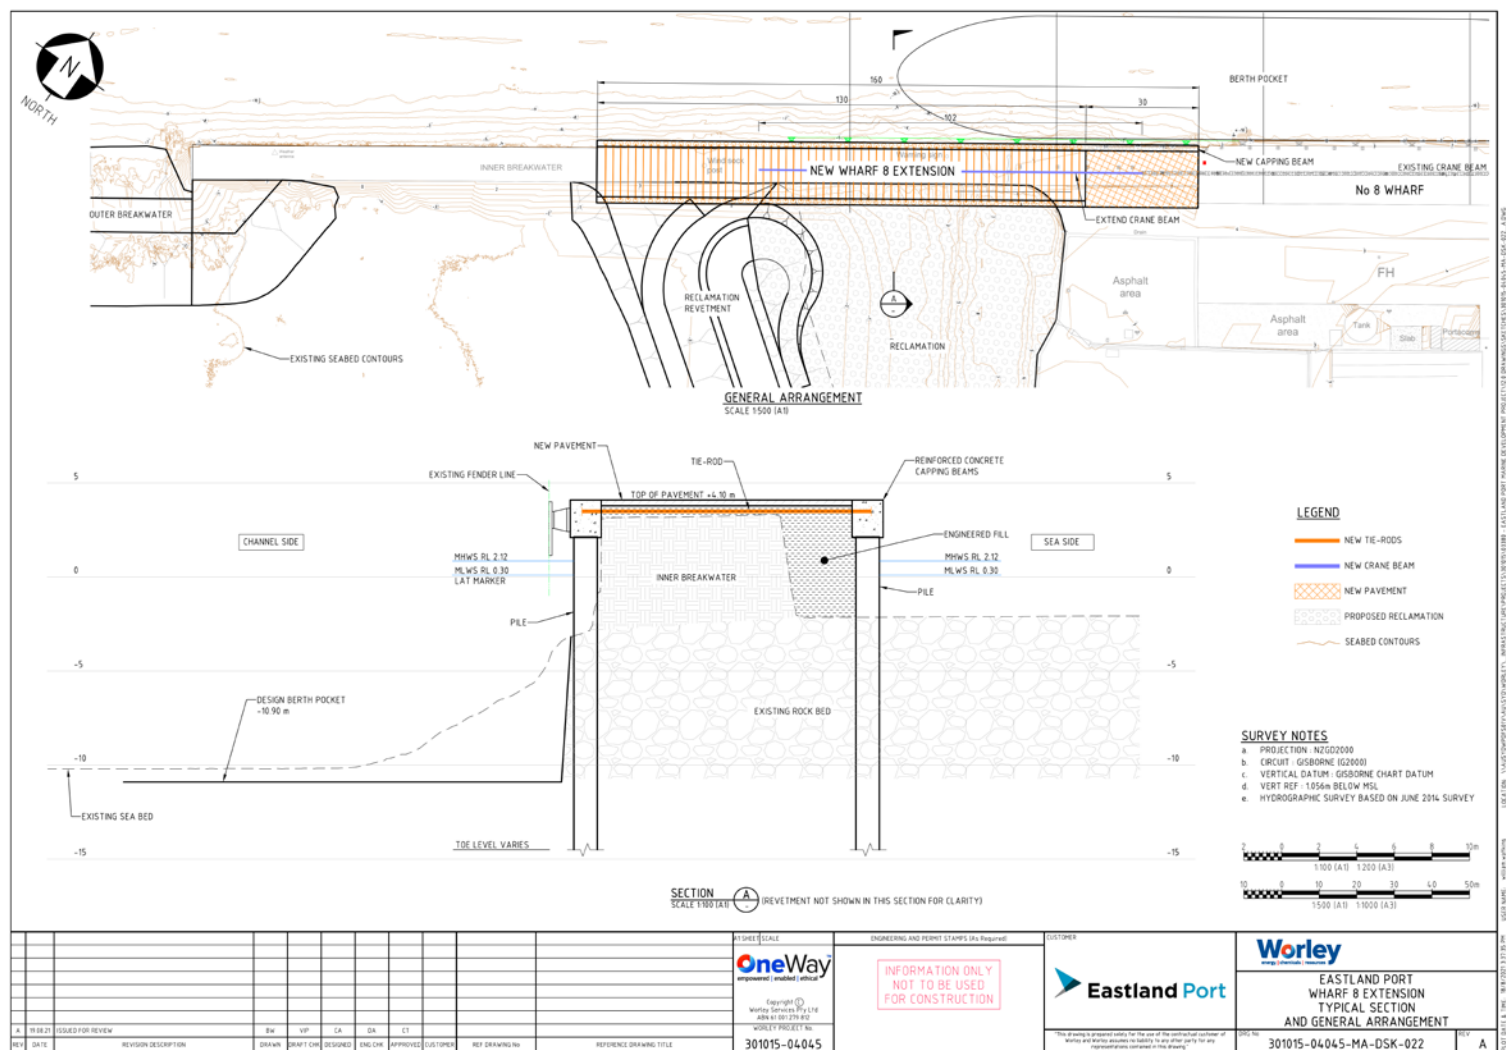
Eastland Port Wharf 8 Extension – Typical Section and General Arrangement
